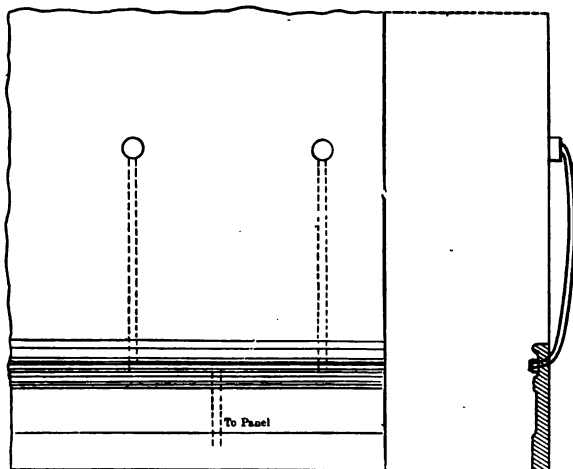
A "Concealed molding" method of wiring bracket outlets.
